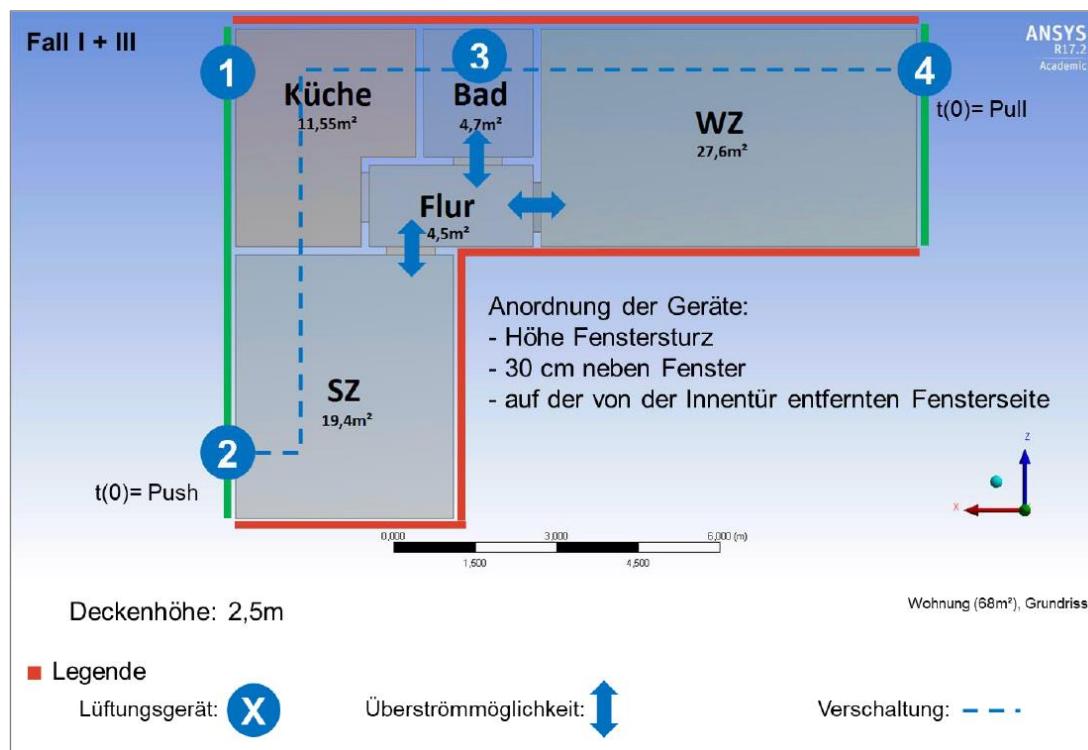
System design Case I and III for an apartment: Alternating BVU No. 2 and 4 are connected (a pair) and require an overflow between SZ (bedroom) and WZ (living room), No. 1 is a twin-unit and No.3 is an extract UVU which also requires an overflow.
